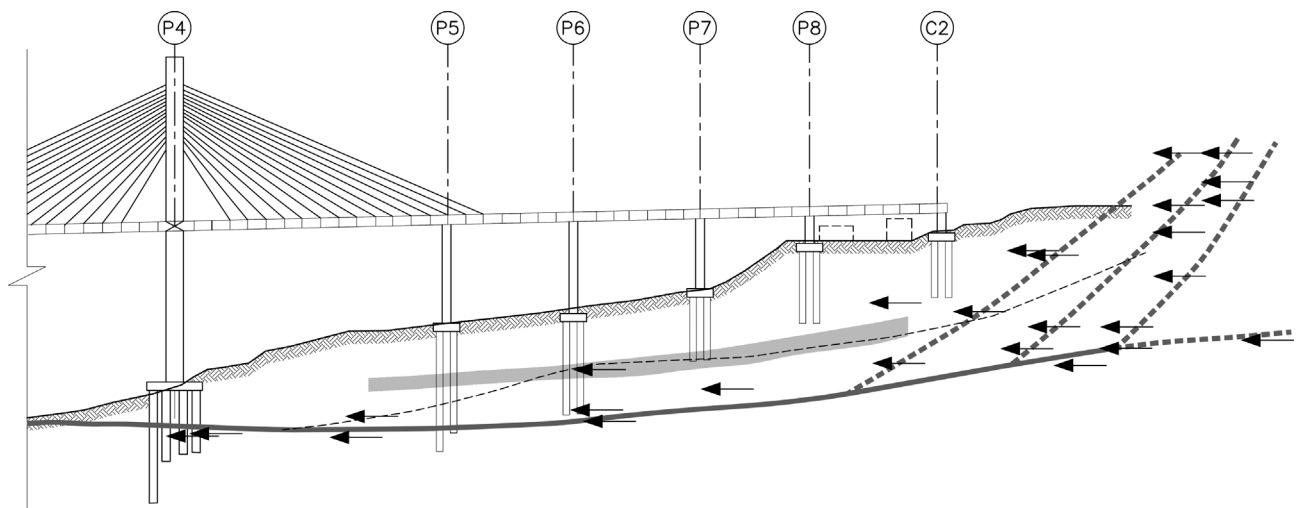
Cross section along the right abutment of the bridge and location of the slip surface.
